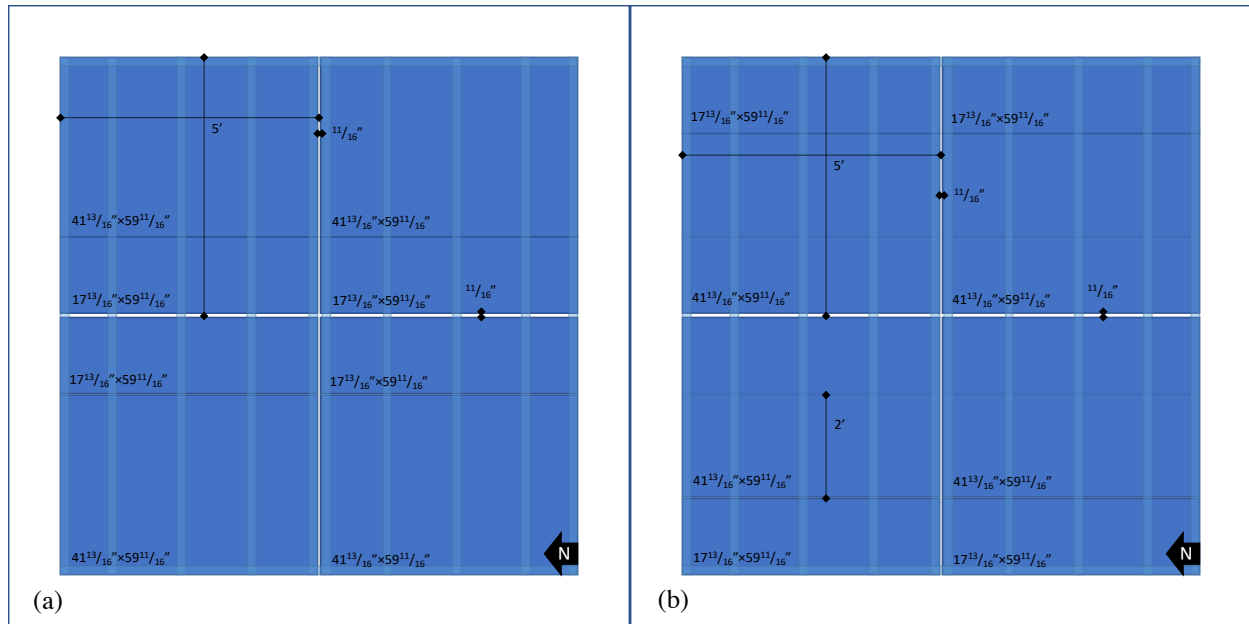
Assembly schematic showing gypsum on (a) base layer and (b) face layer.
